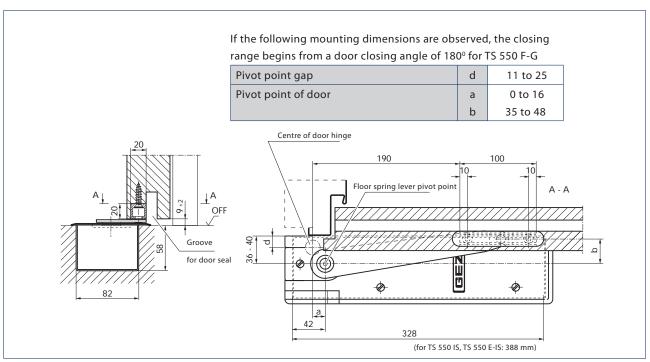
· Installation example: floor spring with lever and guide rail (concealed) to a rebated timber door
